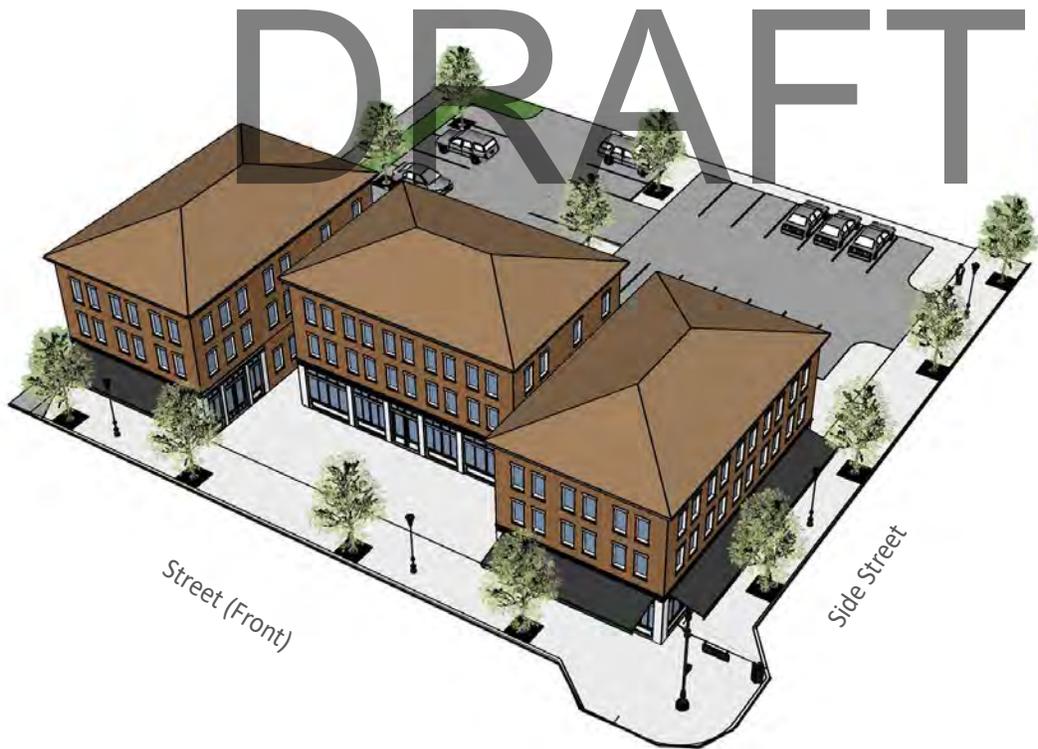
Illustrative example of buildings and site arrangement in the FBO Center District
